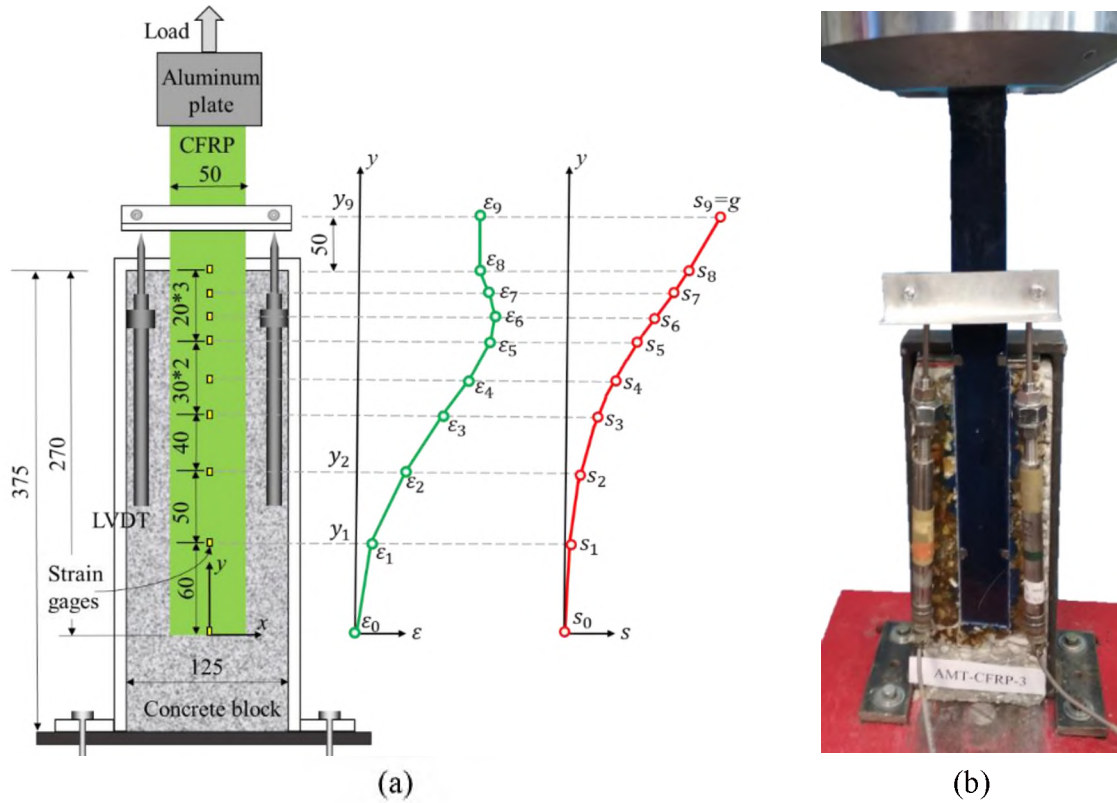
Single-lap direct shear test setup (unit: mm): (a) schematic front view, and (b) photo of front view.
